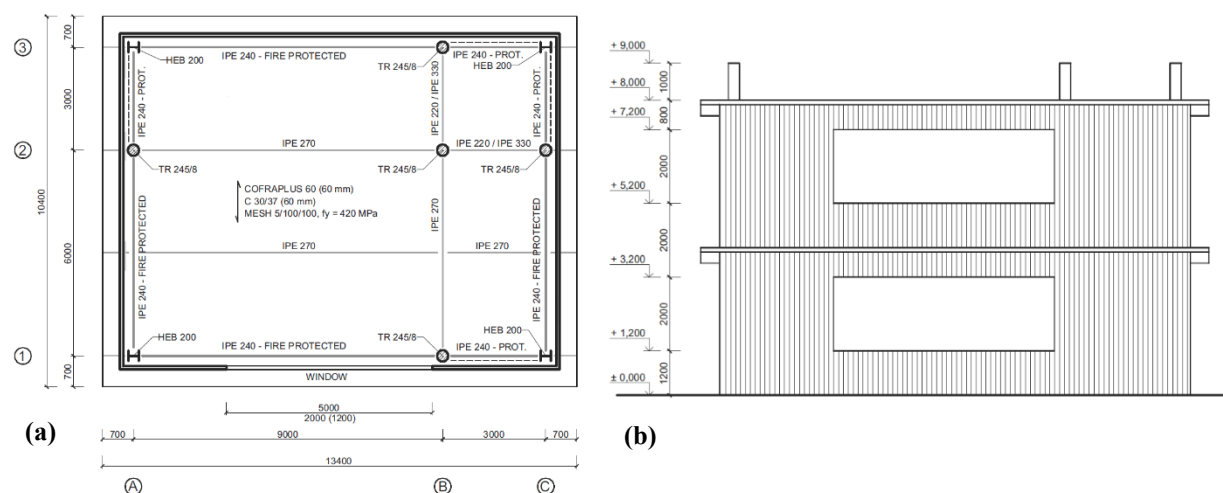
Veselí test building in (a) plan-view with approximate clear floor area 12 m  $\times$  9 m, and (b) in elevation view with one side vertical opening 5 m  $\times$  2 m on the test upper floor (dimensional unit in plots is mm), from Wald *et al.*<sup>55</sup>.
